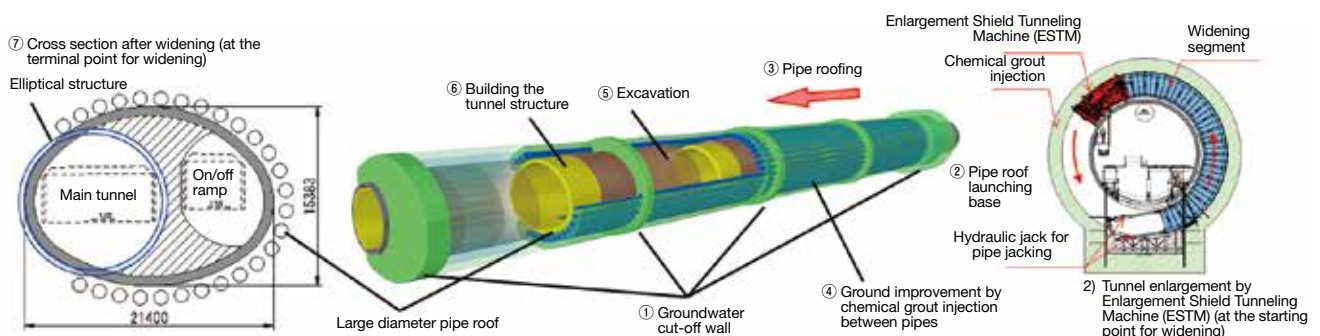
Fig. A new underground large diameter tunnel widening technology that combines Enlargement Shield Tunneling Machine (ESTM) and Large Diameter Pipe Roofing (LDPR)
